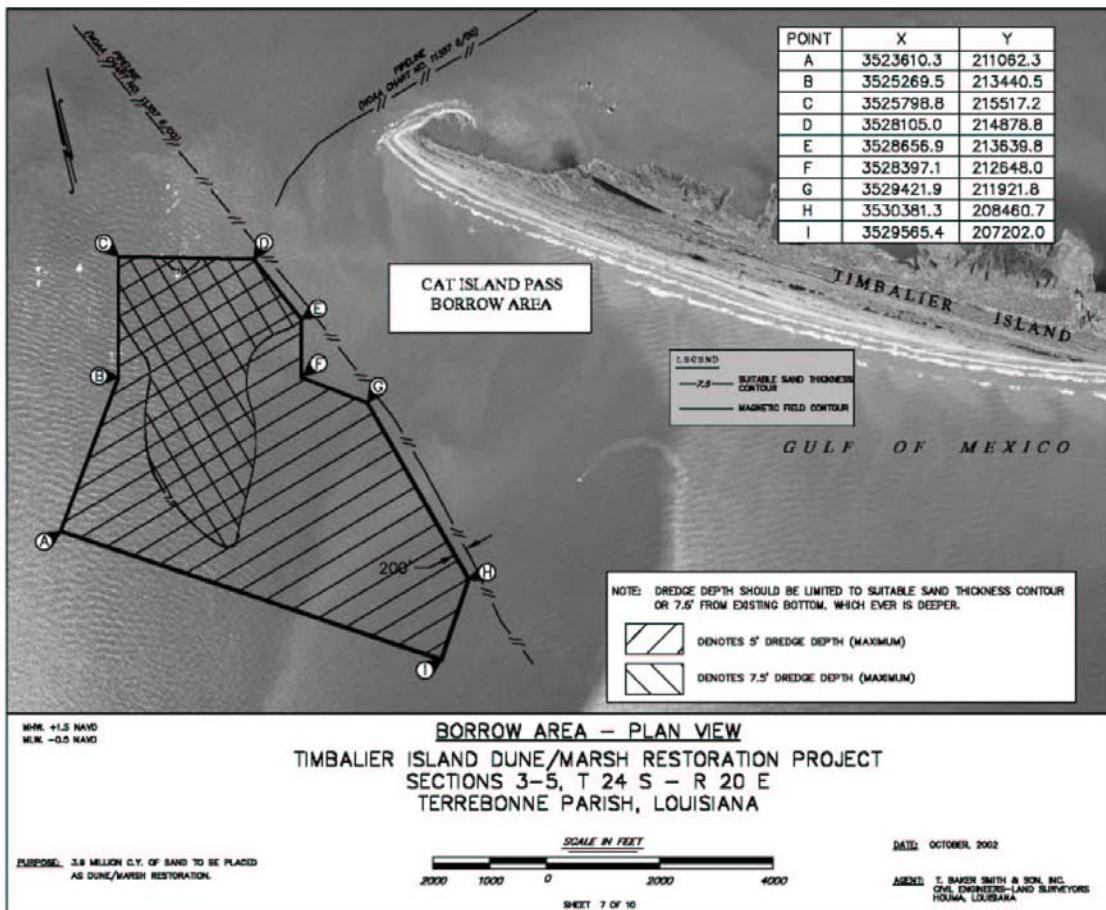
Cat Island Pass Borrow Area – Plan View
